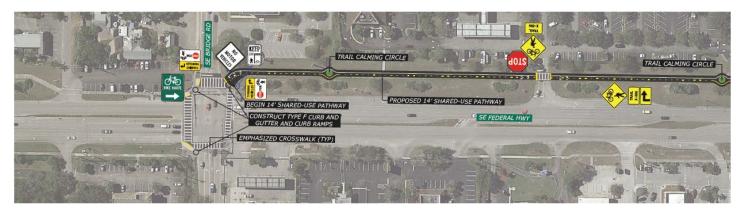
Conceptual Plan View (CR-708/Bridge Road to SE Pine Cir)
